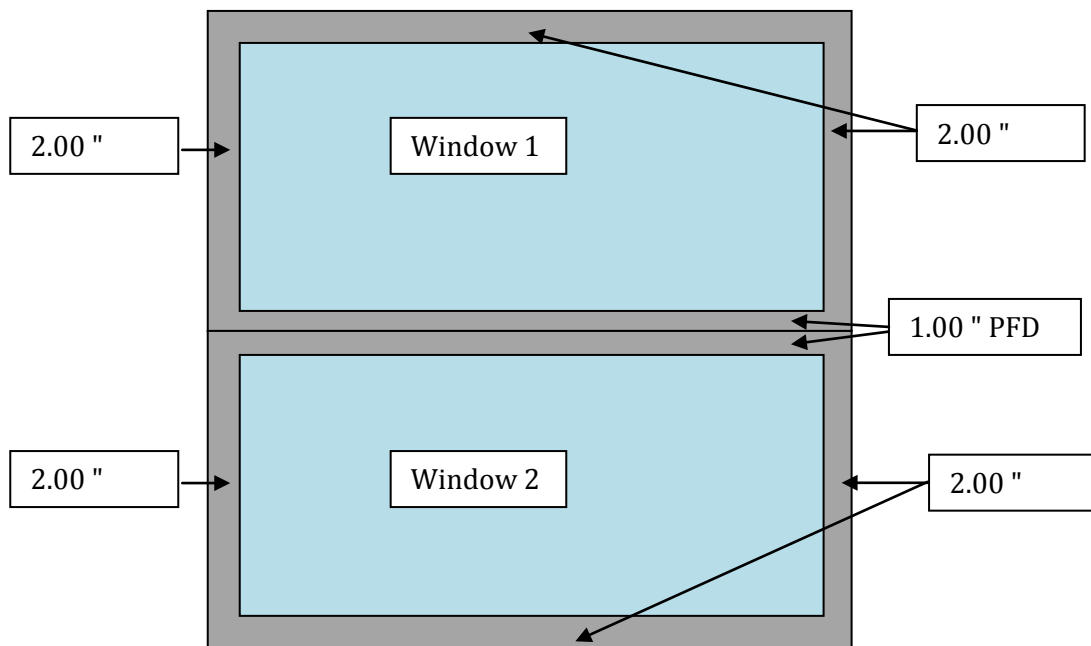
Vinyl Frame Double-Hung Window Subdivision into Two Equal Windows
